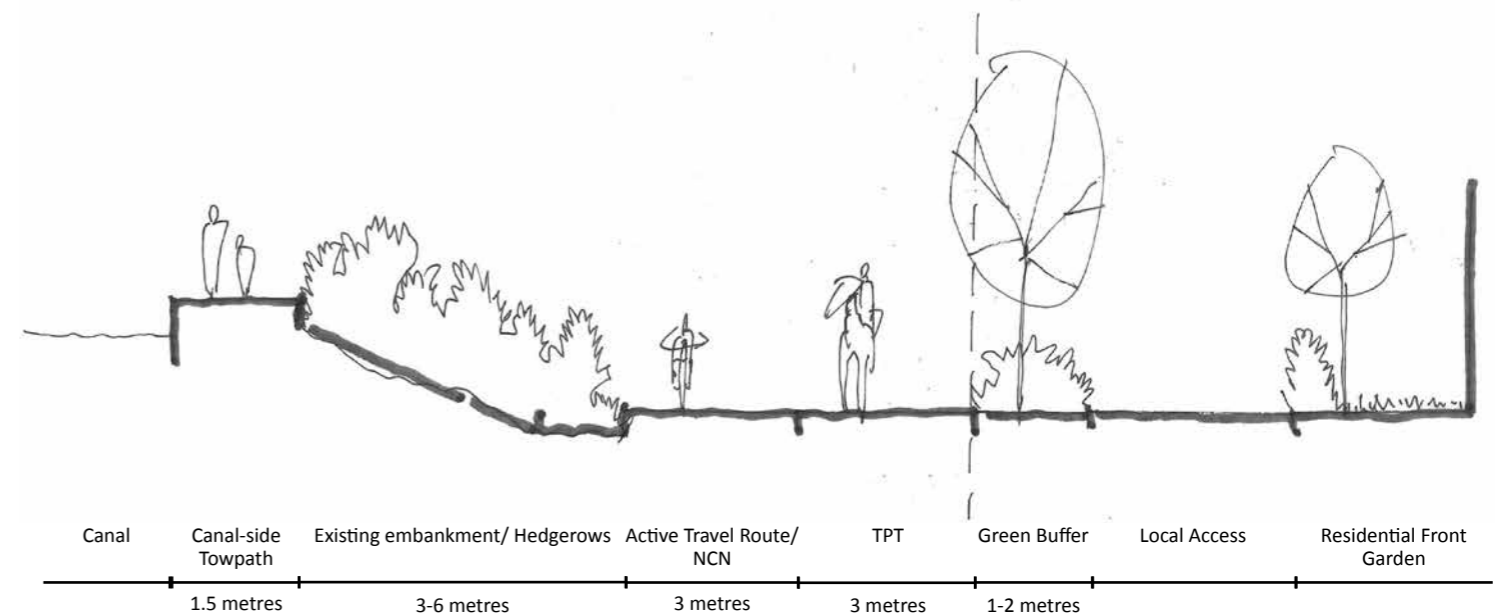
Canal towpath, proposed rerouting of NCN and TPT Cross Section
